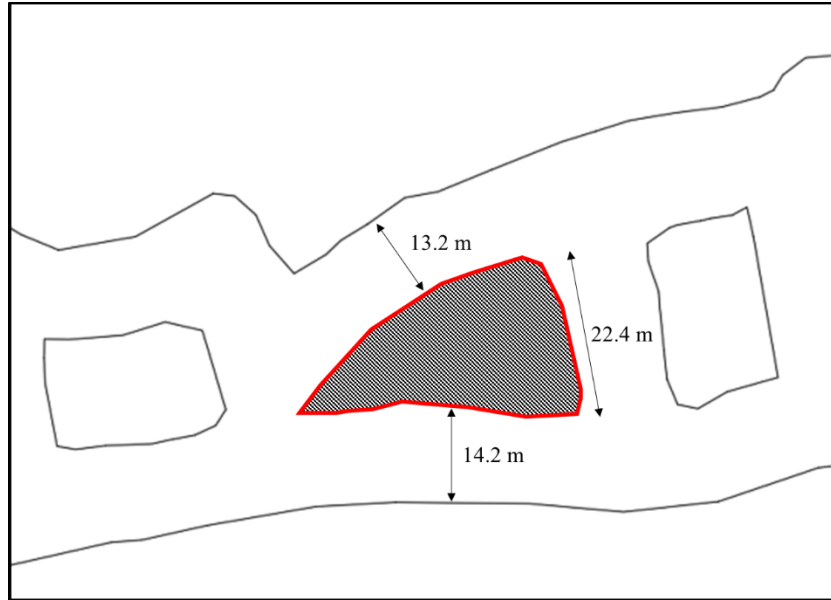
Schematic view of Pillar-X next to original design pillars.
